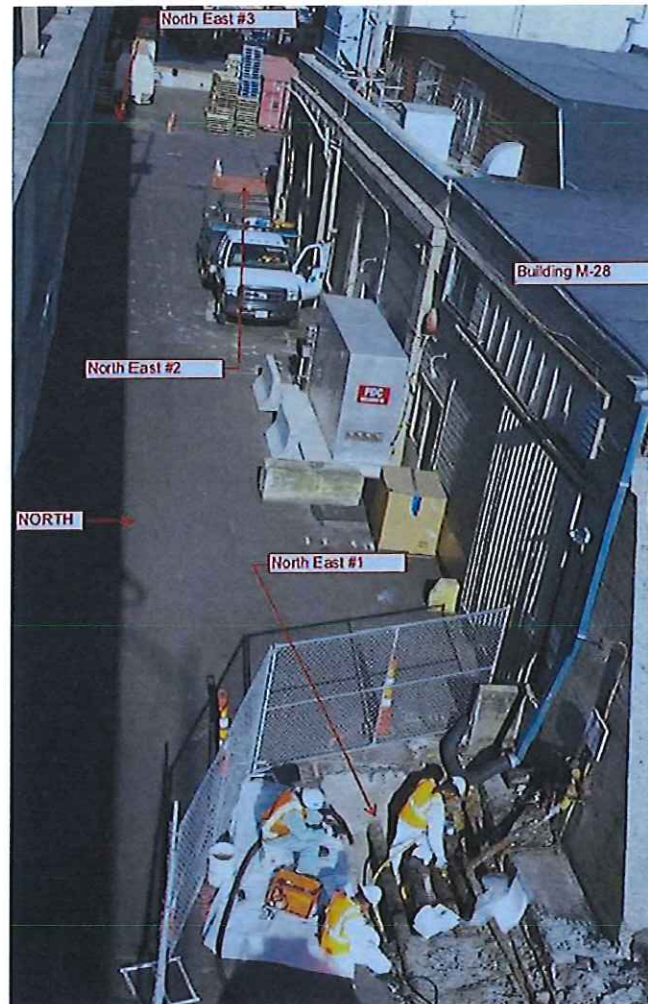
LOOKING WEST DOWN GARFIELD STREET TOWARD BUILDING M-28
